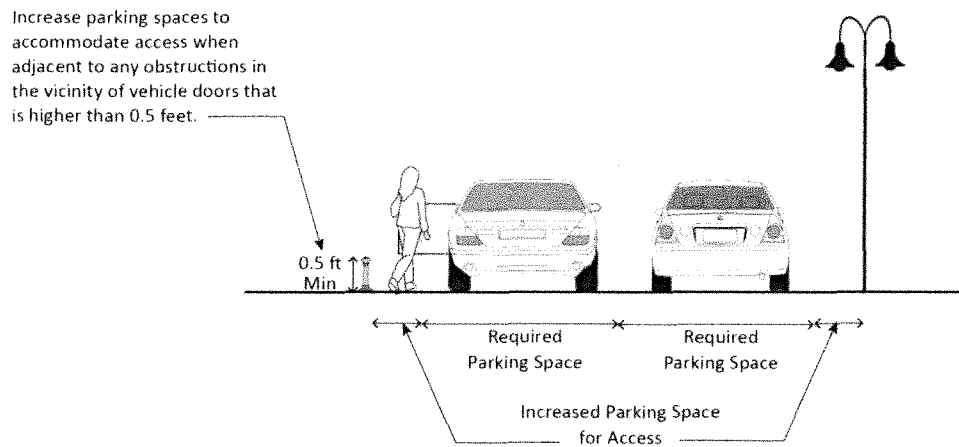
D.3: PARKING SPACES ABUTTING WALL OR FENCE
